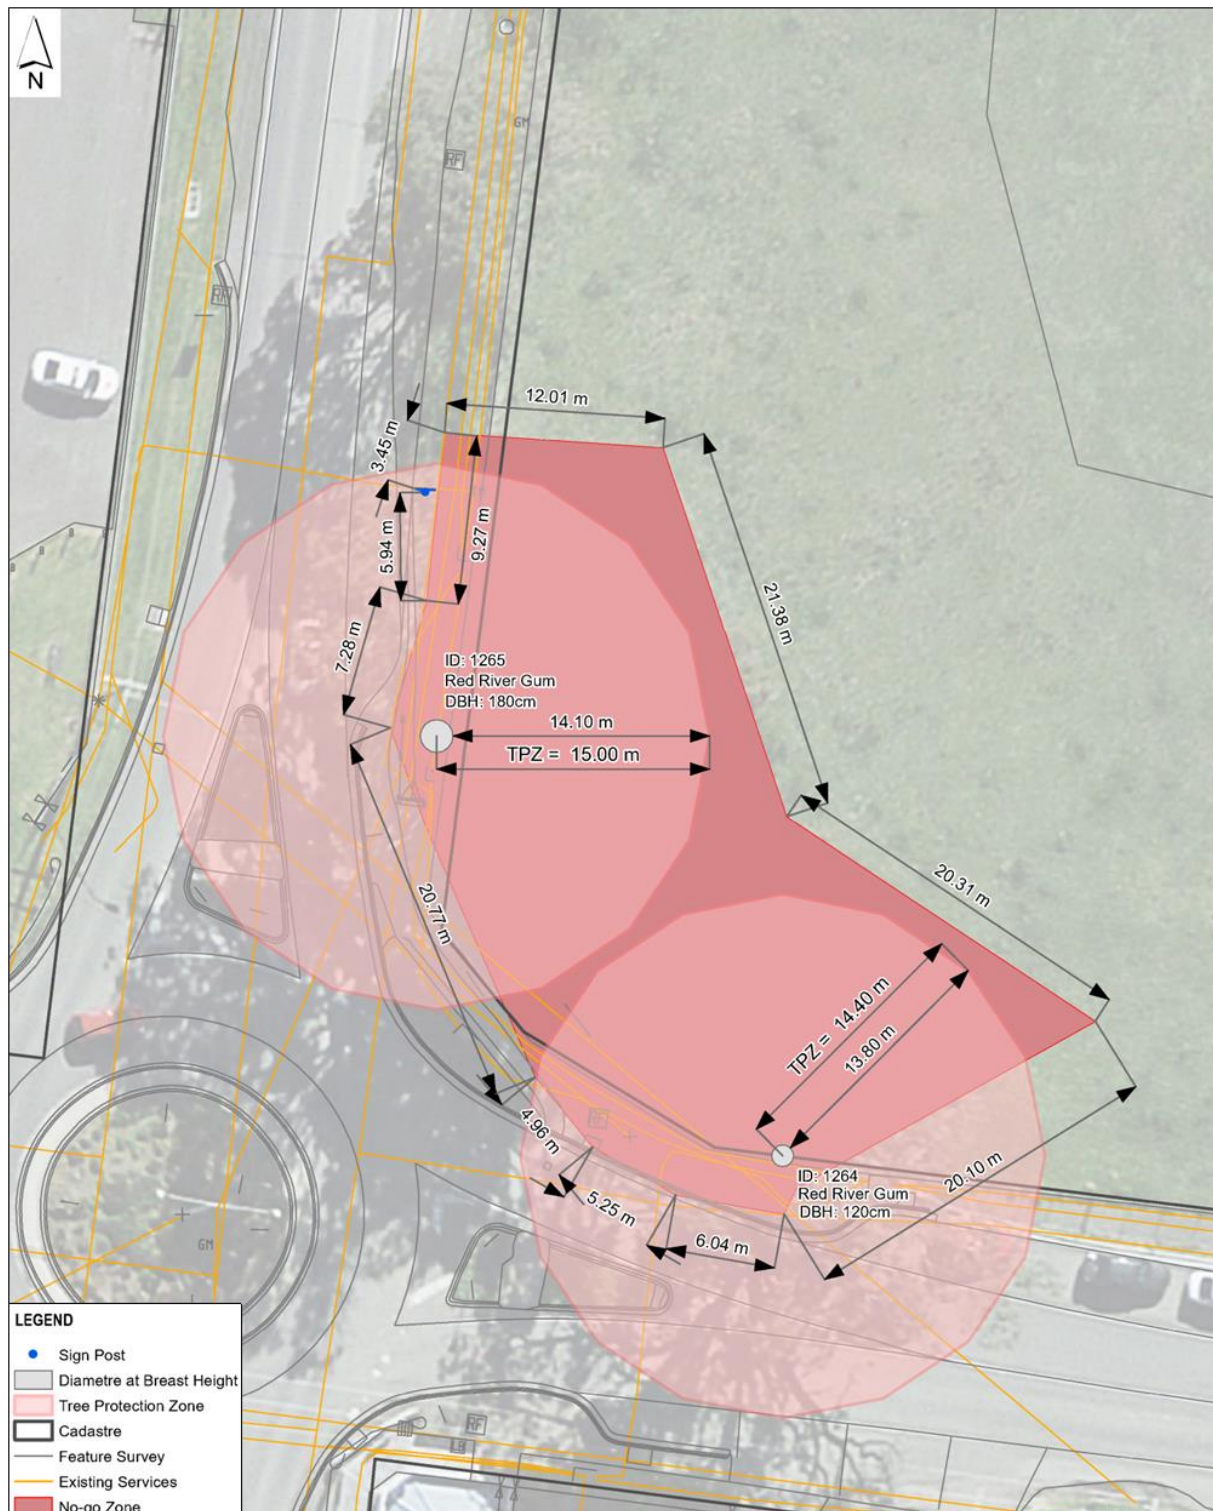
Indicative tree protection Plan for two River Red Gum trees at Bridge Inn Road intersection.
